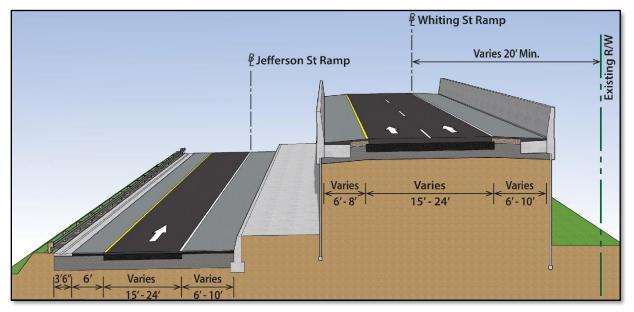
Proposed Typical Section – Whiting Street Off-Ramp (On MSE wall) and Jefferson Street On-Ramp
